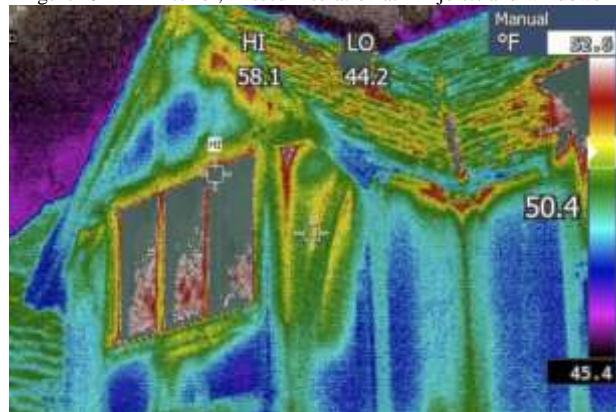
P2 Exterior thermal bridges and leakage at front of building
